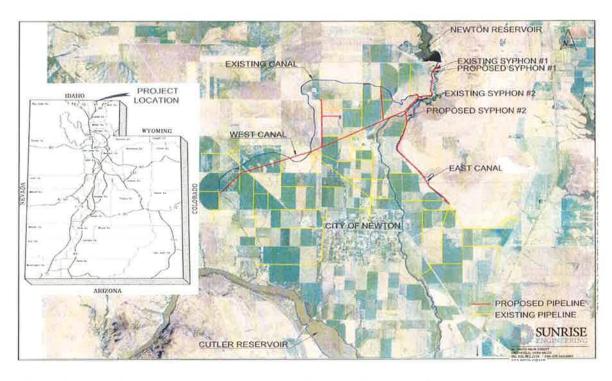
Location and Layout of proposed Newton Canal Enclosure.
